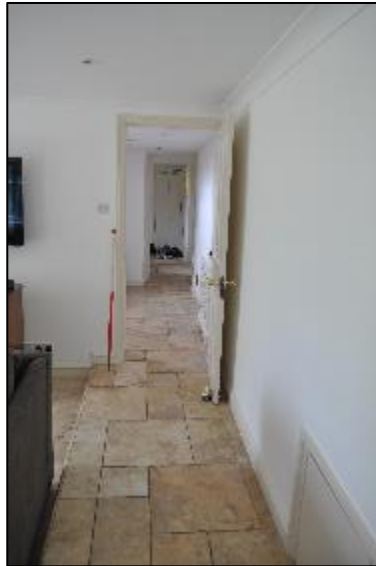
Looking towards G6 & G7 from G5. Note the step and the small cupboard to the right
